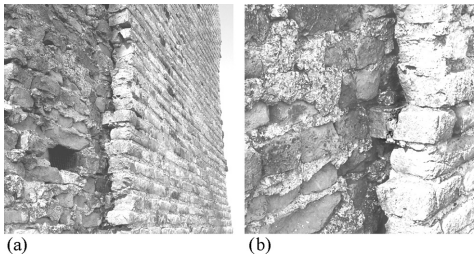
View of the cladding connection (a) and detail of a cracked brick in the header bond (b).
